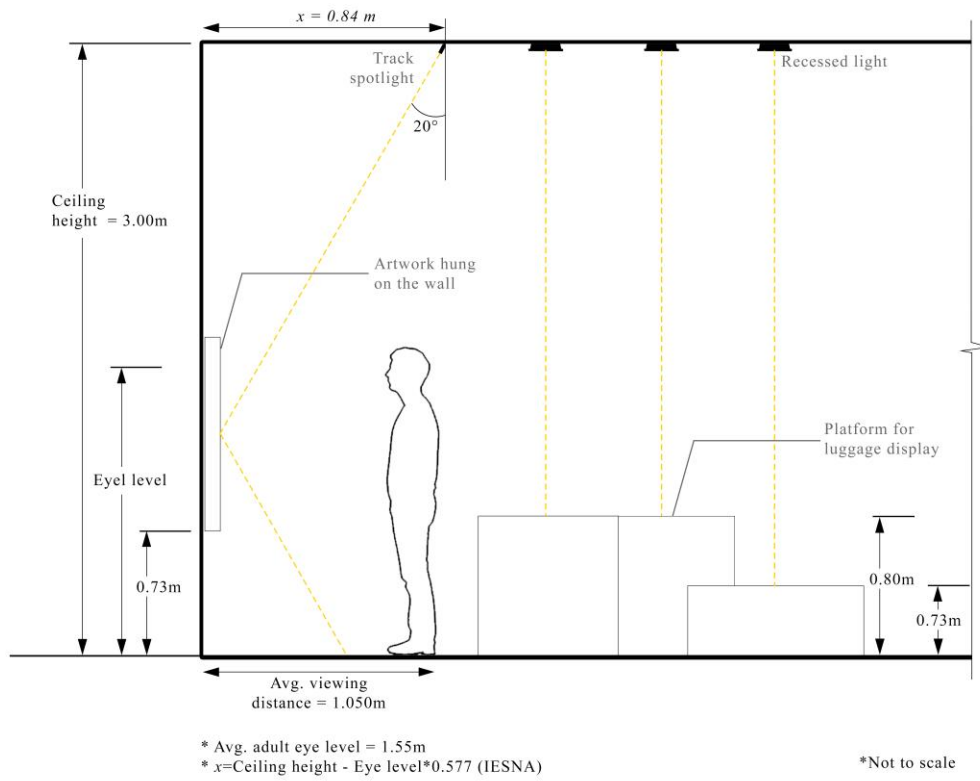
AA' Section - The mounted luminaire details in Room 1
